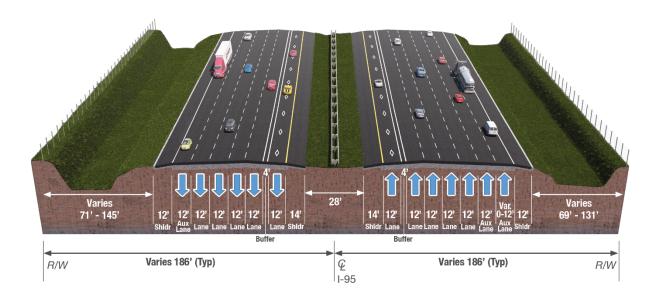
Typical Section – I-95 South of Central Boulevard (Mainline Alternative 2)
